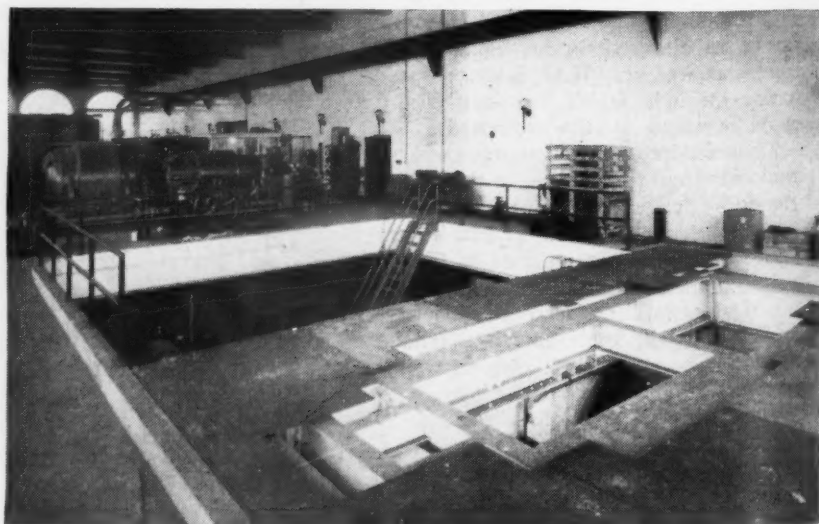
Well opening and foundation for new 3,000 kw. generator on power house generating floor. New control board will be located by engineer's office in background.
